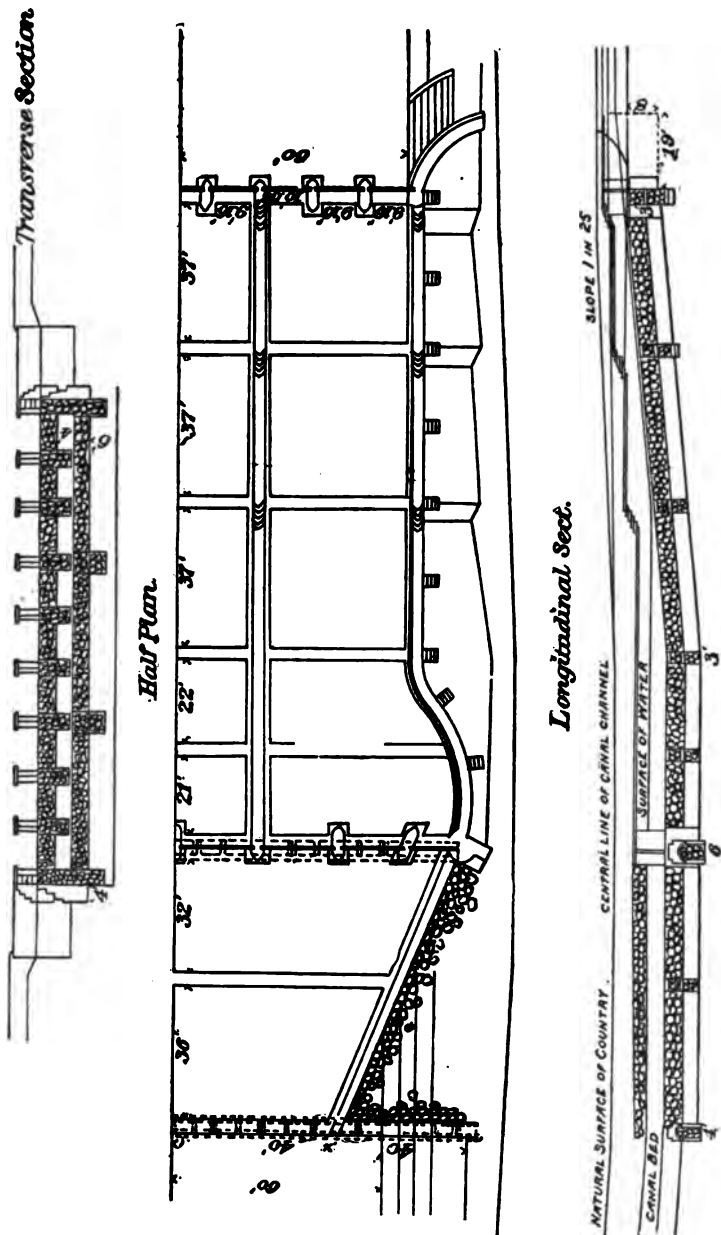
PLATE XIV.—Plan of Rapids, Bari Doab Canal, India.
